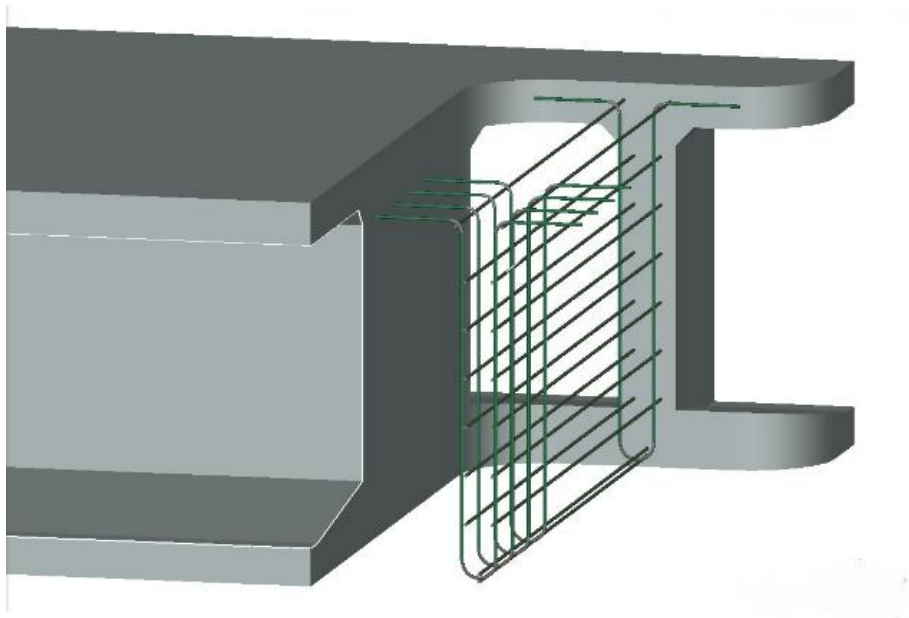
Integral Bent Cap Girder Reinforcement
